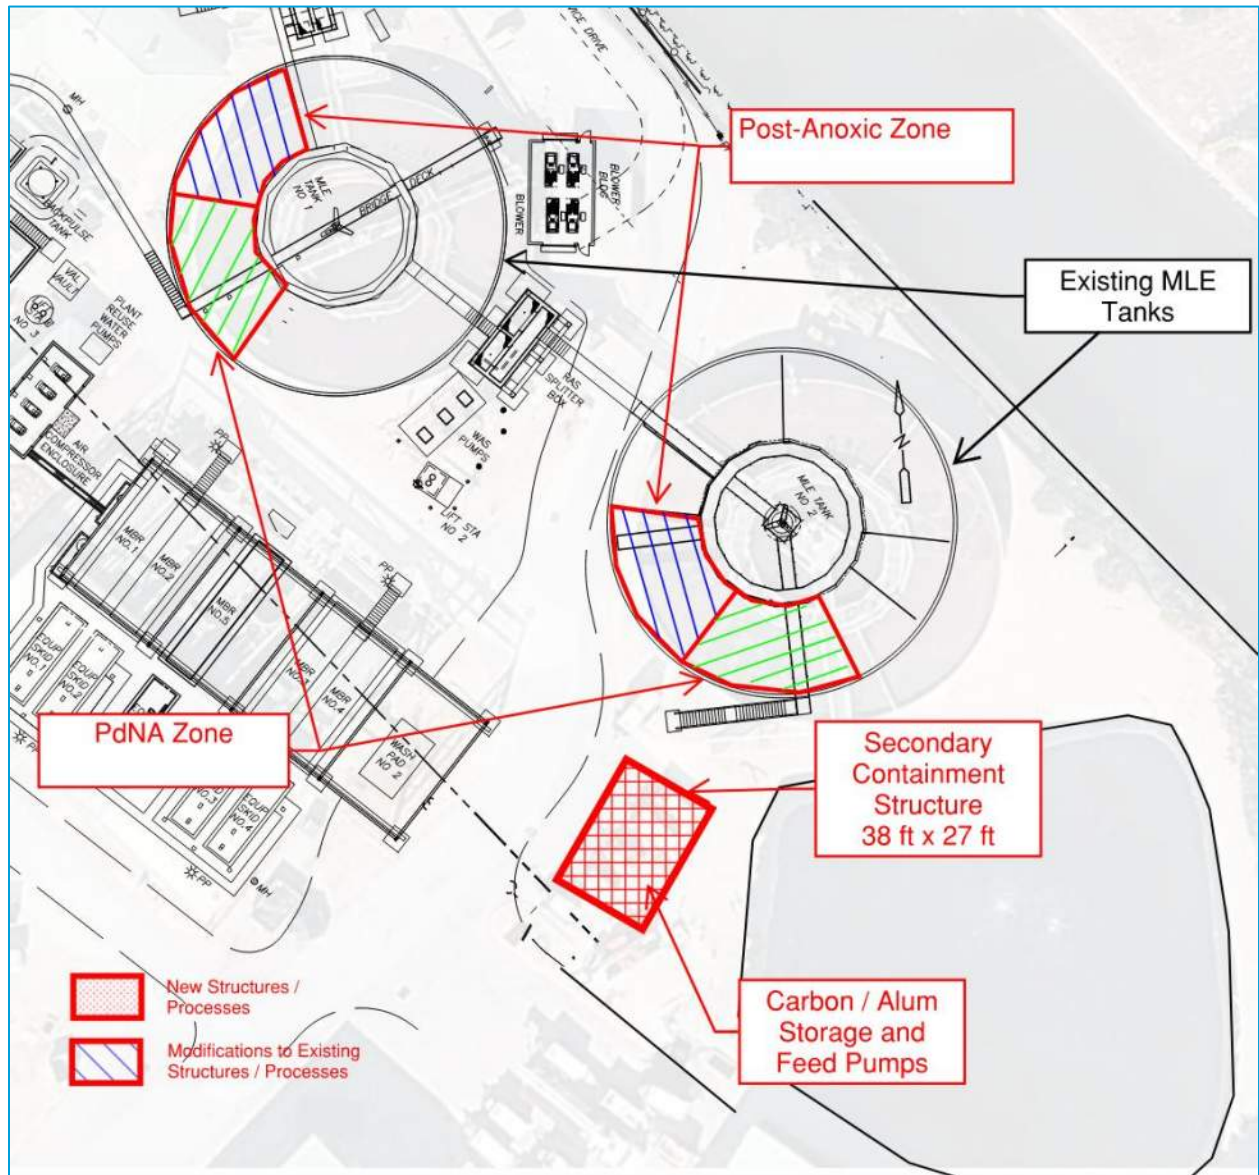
Alternative 3 – PdNA + Chem-P Site Layout
